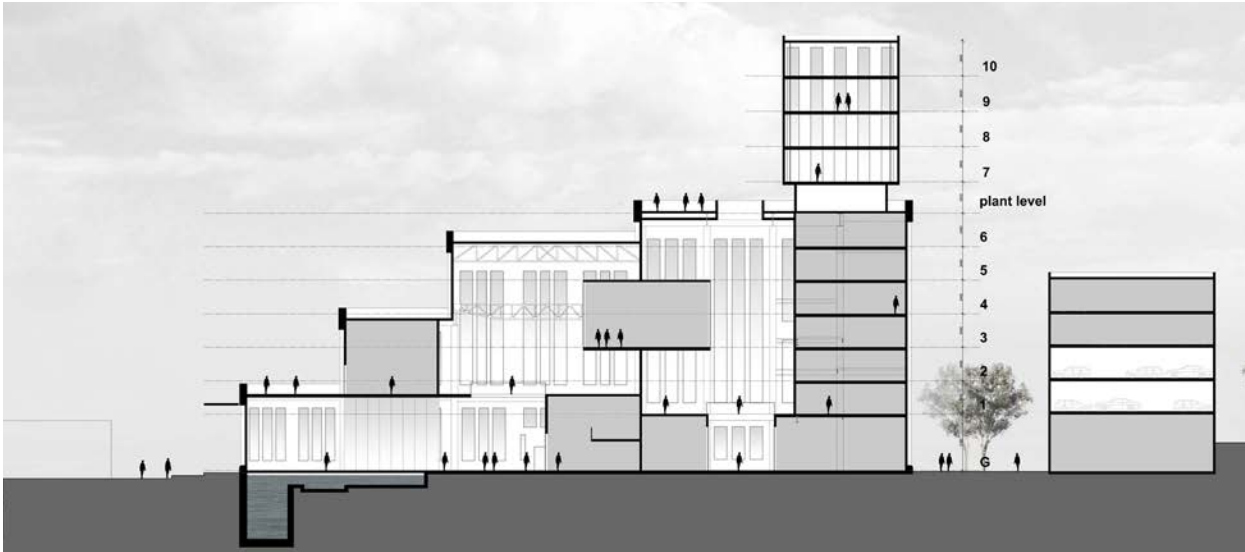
South Fremantle Power Station Elevation demonstrating mixed use potential of structure.
